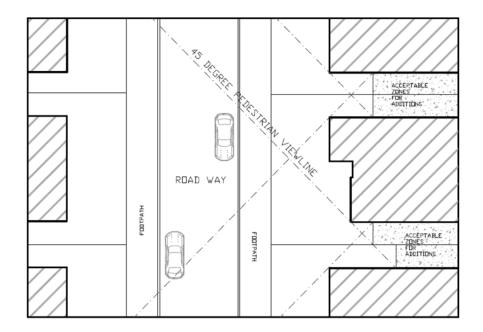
acceptable areas for ground level additions are sited within the area created by drawing a 45 degree view line from the opposite footpath through the front corner of the subject building and the corners of adjacent buildings.
